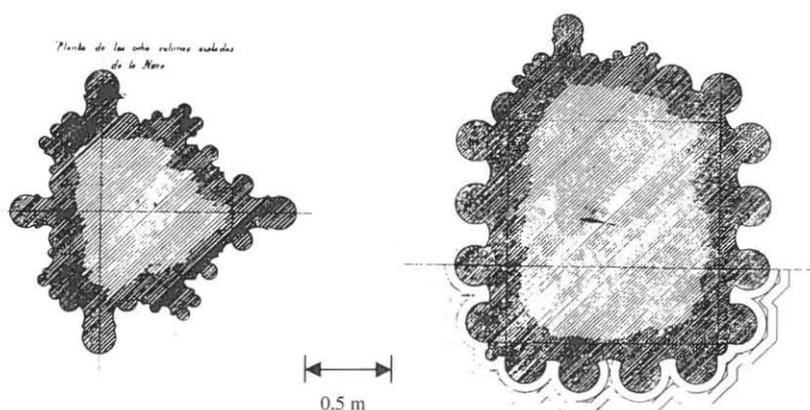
Transverse section of the nave piers and the piers sustaining the cimborio as represented in the 1864 plans (*E I:40*).
